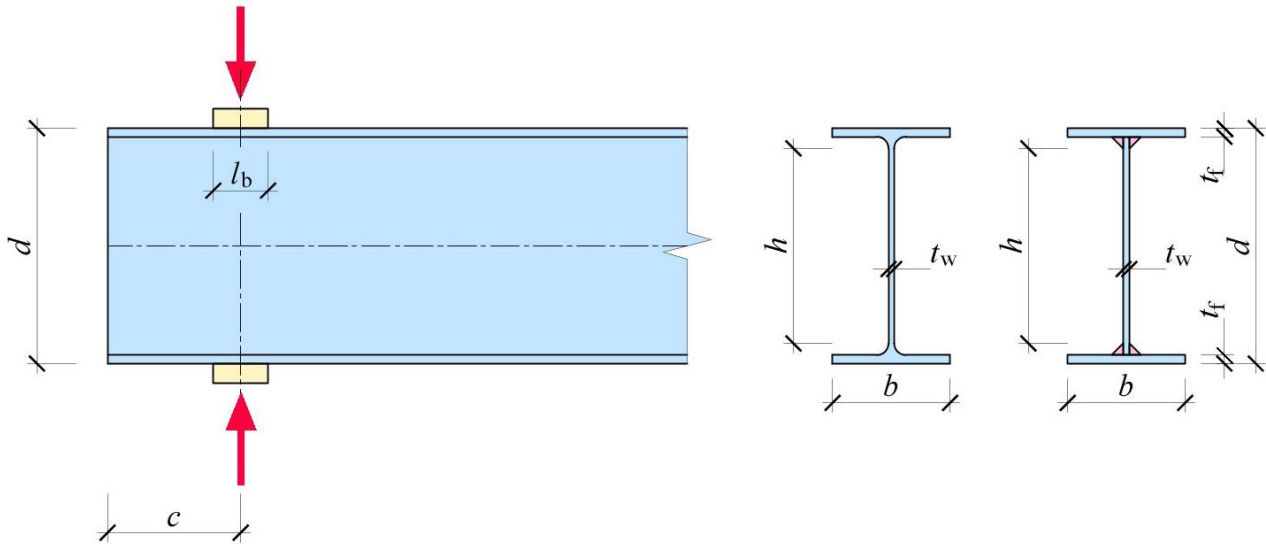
AISC 360-16: (a) loading near the end of member, (b) rolled section, (c) welded section
